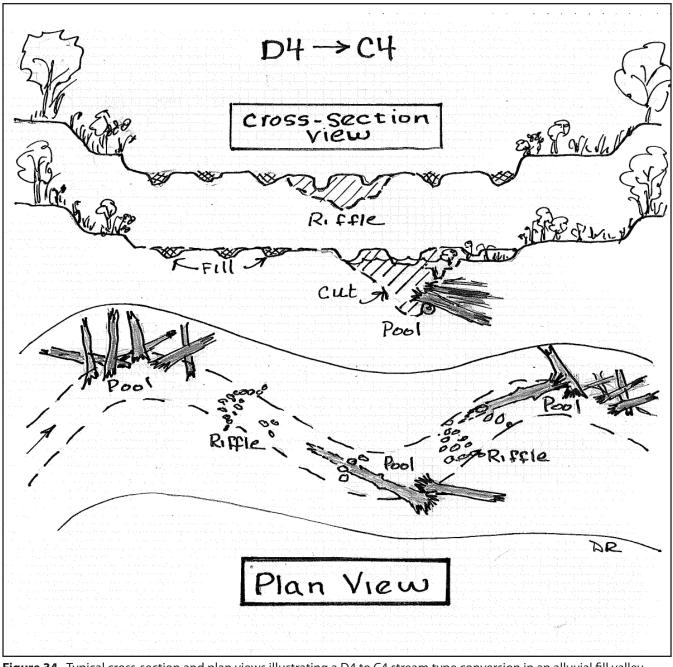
Typical cross-section and plan views illustrating a D4 to C4 stream type conversion in an alluvial fill valley (Valley Type VIII), and the proposed streambank stabilization and fish habitat structures by typical location.
